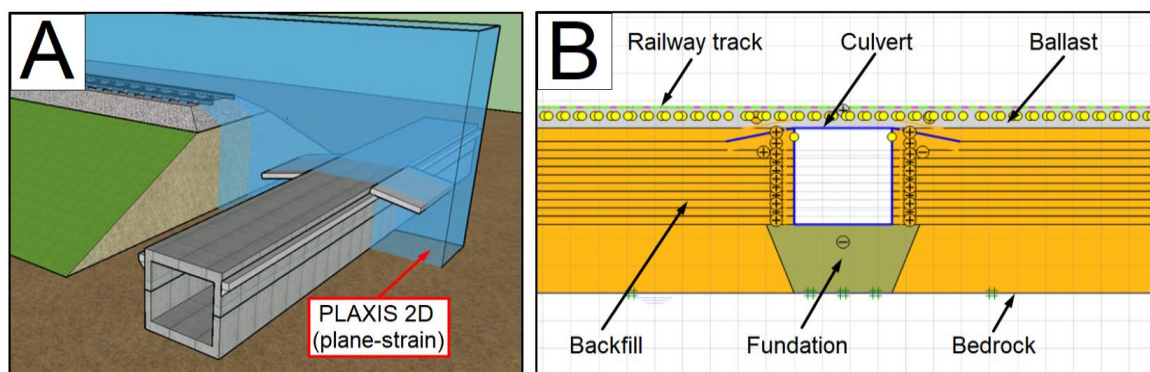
Principles of plane-strain when introducing a concrete culvert into the system, showing A) a principal sketch of the culvert in relation to the railway structure and B) an illustration of an effective plane in PLAXIS 2D with designations
